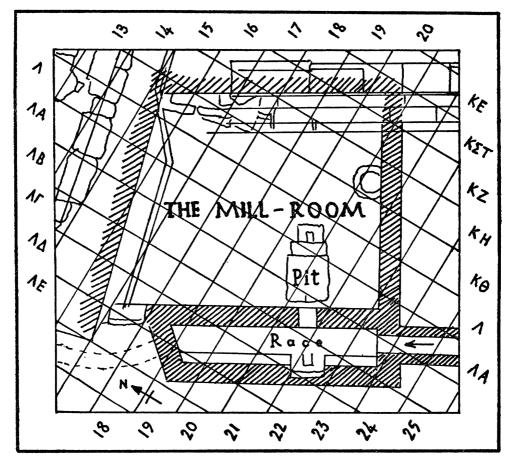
Plan of the Flour Mill, showing one-meter Excavation Grid of Section Iota (from Section Plan 1:100).
